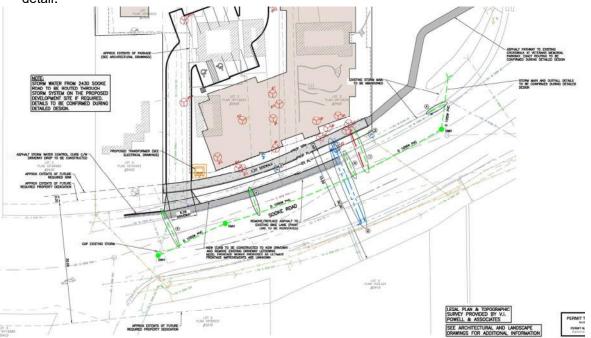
November 2024 McElhanney rezoning Conceptual Servicing Plan Sooke Road frontage detail.
